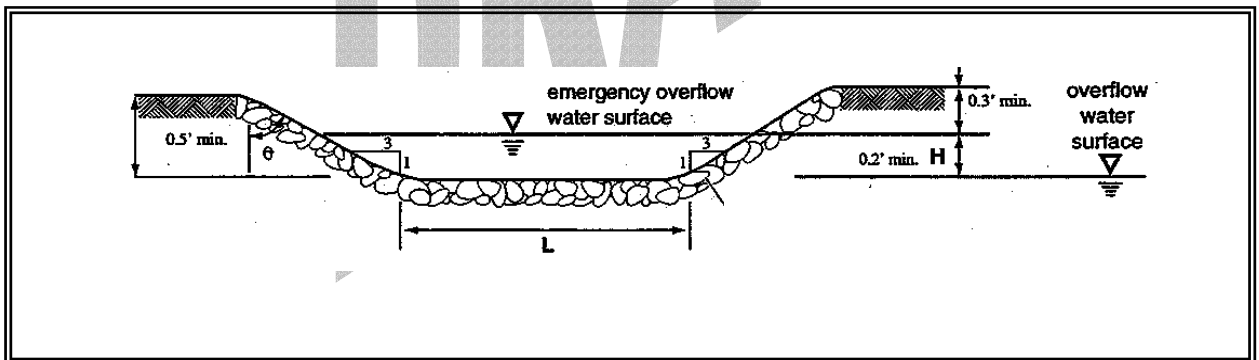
Weir Section for Emergency Overflow Spillway
